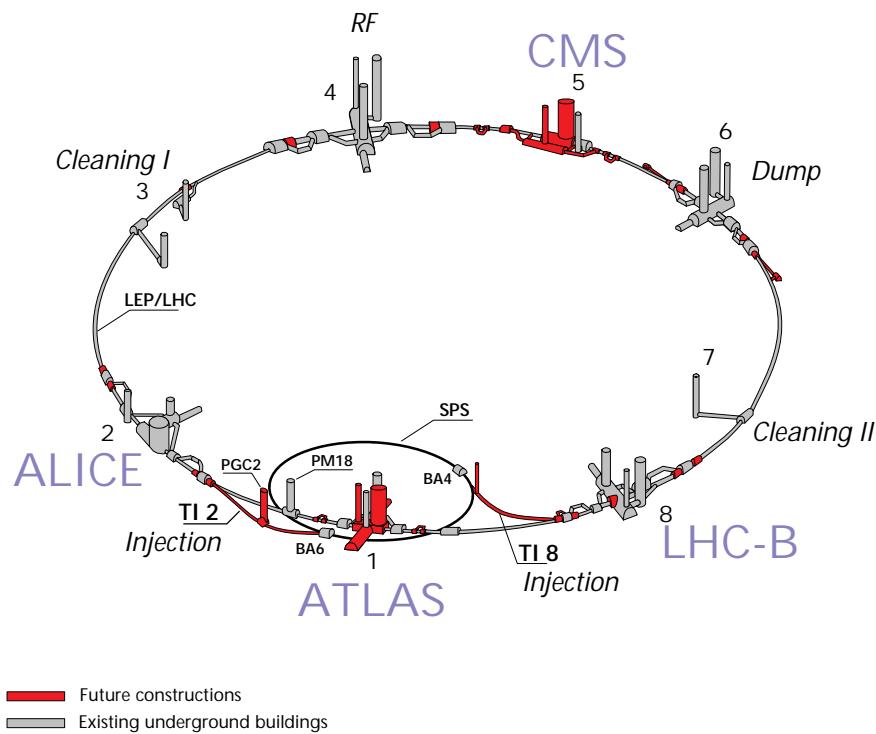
New Civil Engineering. The existing LEP tunnel, experimental halls and access shafts are shown in bright grey. The new experimental halls for ATLAS and CMS with their access shafts, the new transfer tunnels and the new beam dump tunnels are shown in red (or dark grey in the printed version).
